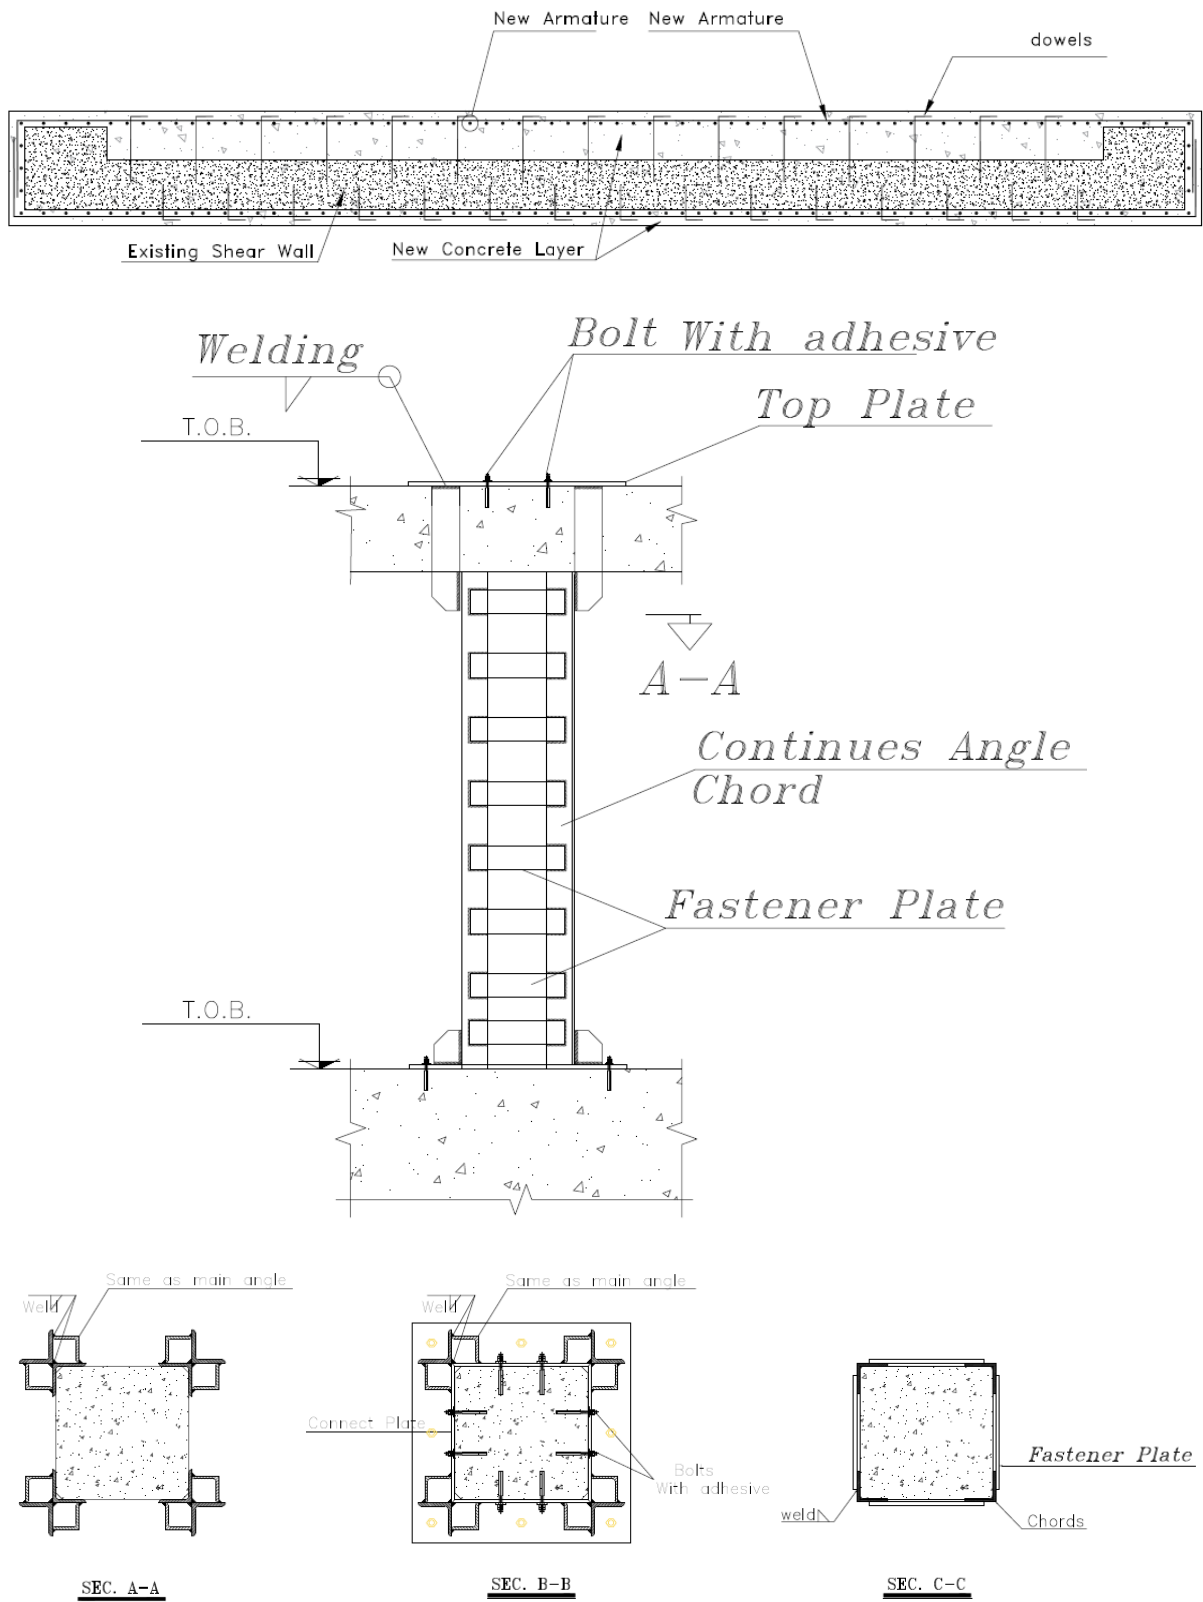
samples of some provided retrofitting detail drawings for structural elements
